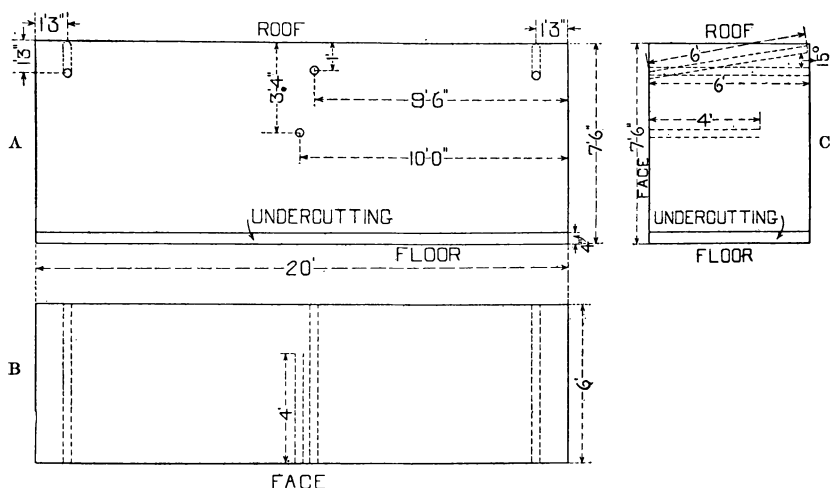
A proper arrangement of holes in room with coal undercut. A, front view; B, plan; C, side view.
